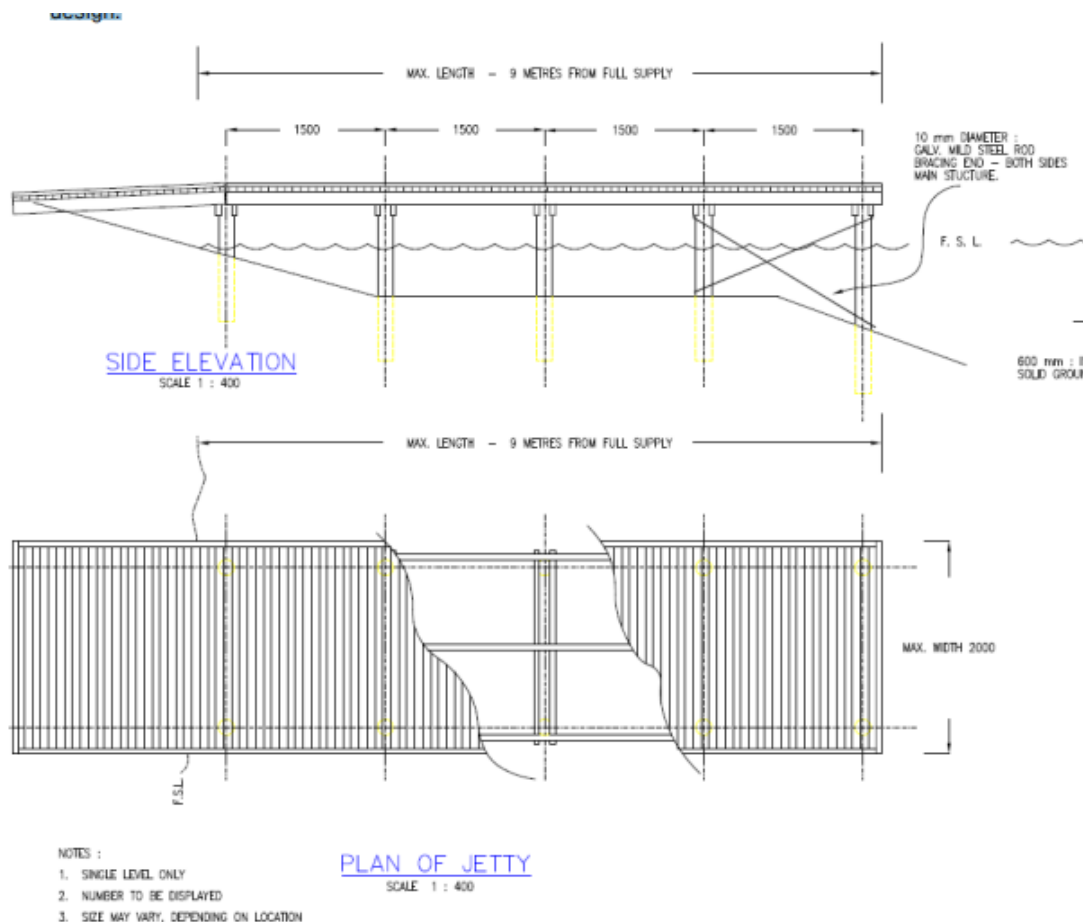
GMW standard Jetty plan, drawing number 470916.
